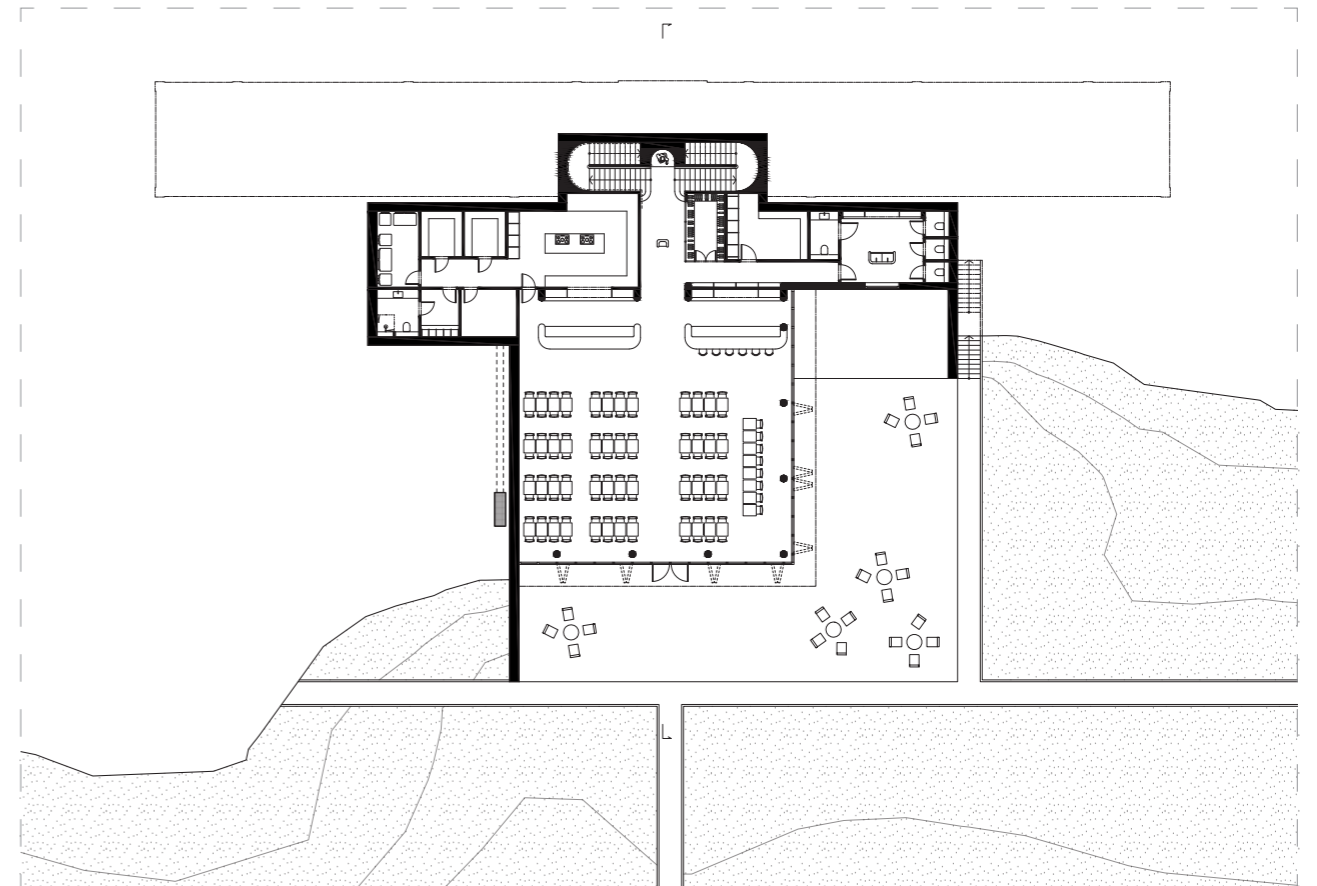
Wedding scenario, Bottom floor plan. Scale 1:400.
